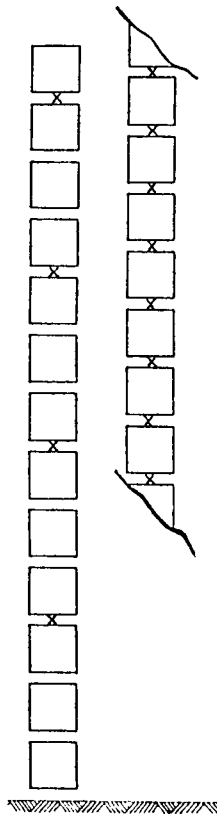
(b) In-Rack Sprinkler Arrangement, Group A Plastic Commodity, Single Row Racks, Height of Storage over 25 Ft.
